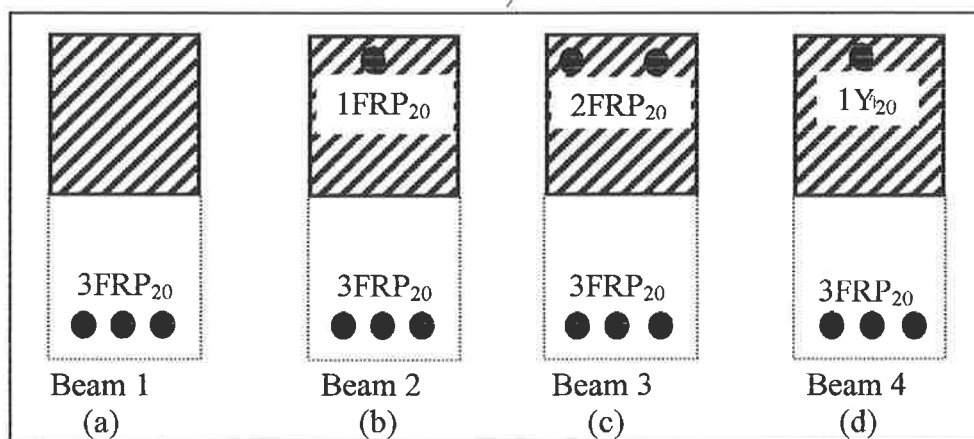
Cross-sections of beams with different amount and type of compressive rebars.
